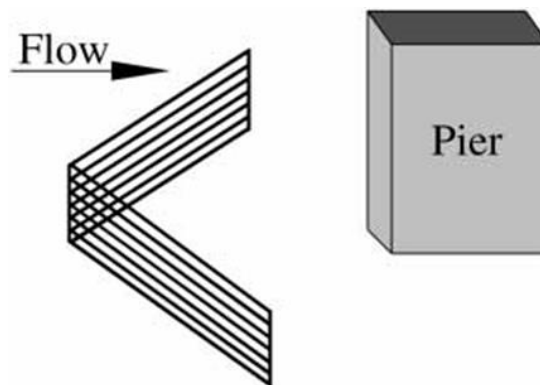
Permeable sheet pile upstream of a pier (Parker et al., 1998)
